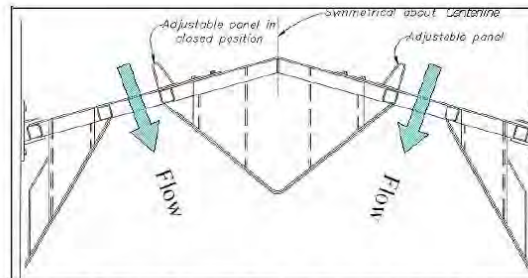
Plan view of a dual-slot chevron shaped baffle with downstream guide walls.
